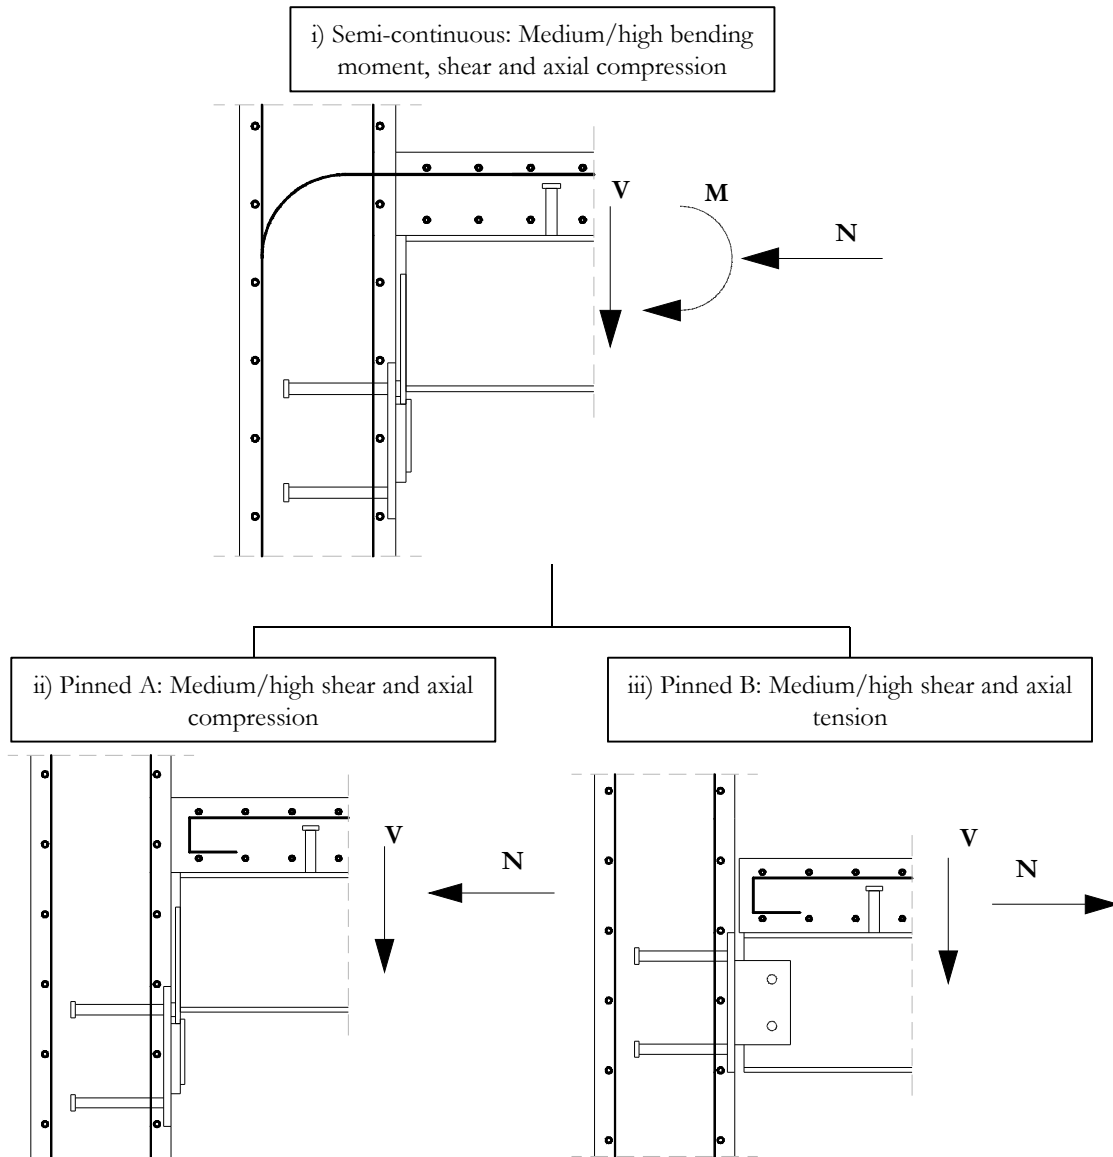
Steel-to-concrete joint solutions using similar joint configurations
